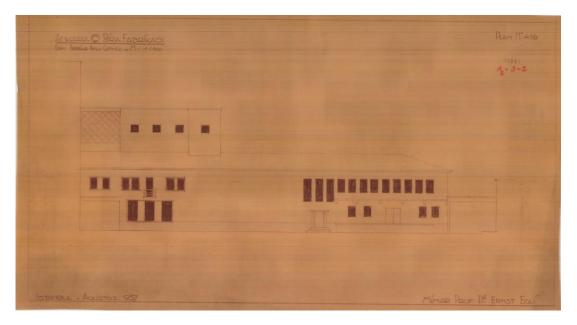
The north (courtyard) elevation drawing of the second proposal, 1937, Egli (Source: TTA Archive)
